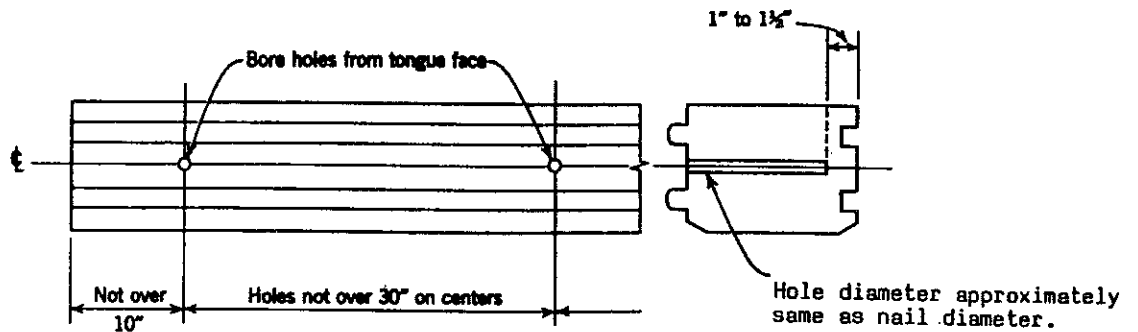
Boring Detail. Locate end holes not over 10 inches from end of piece.
